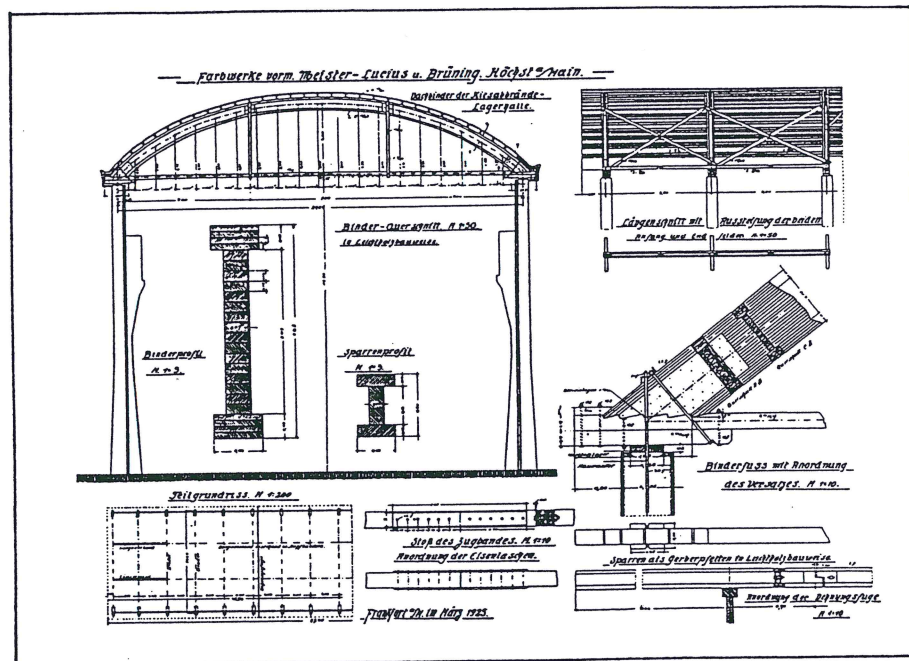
Industrial hall in Frankfurt/ Main, two hinged arch girders, span 21.2m
